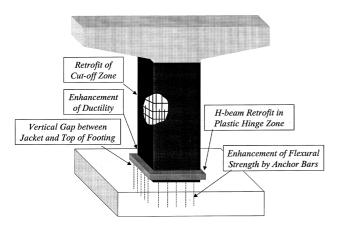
Seismic retrofit of reinforced concrete piers by steel jacket with controlled increase of flexural strength method.
